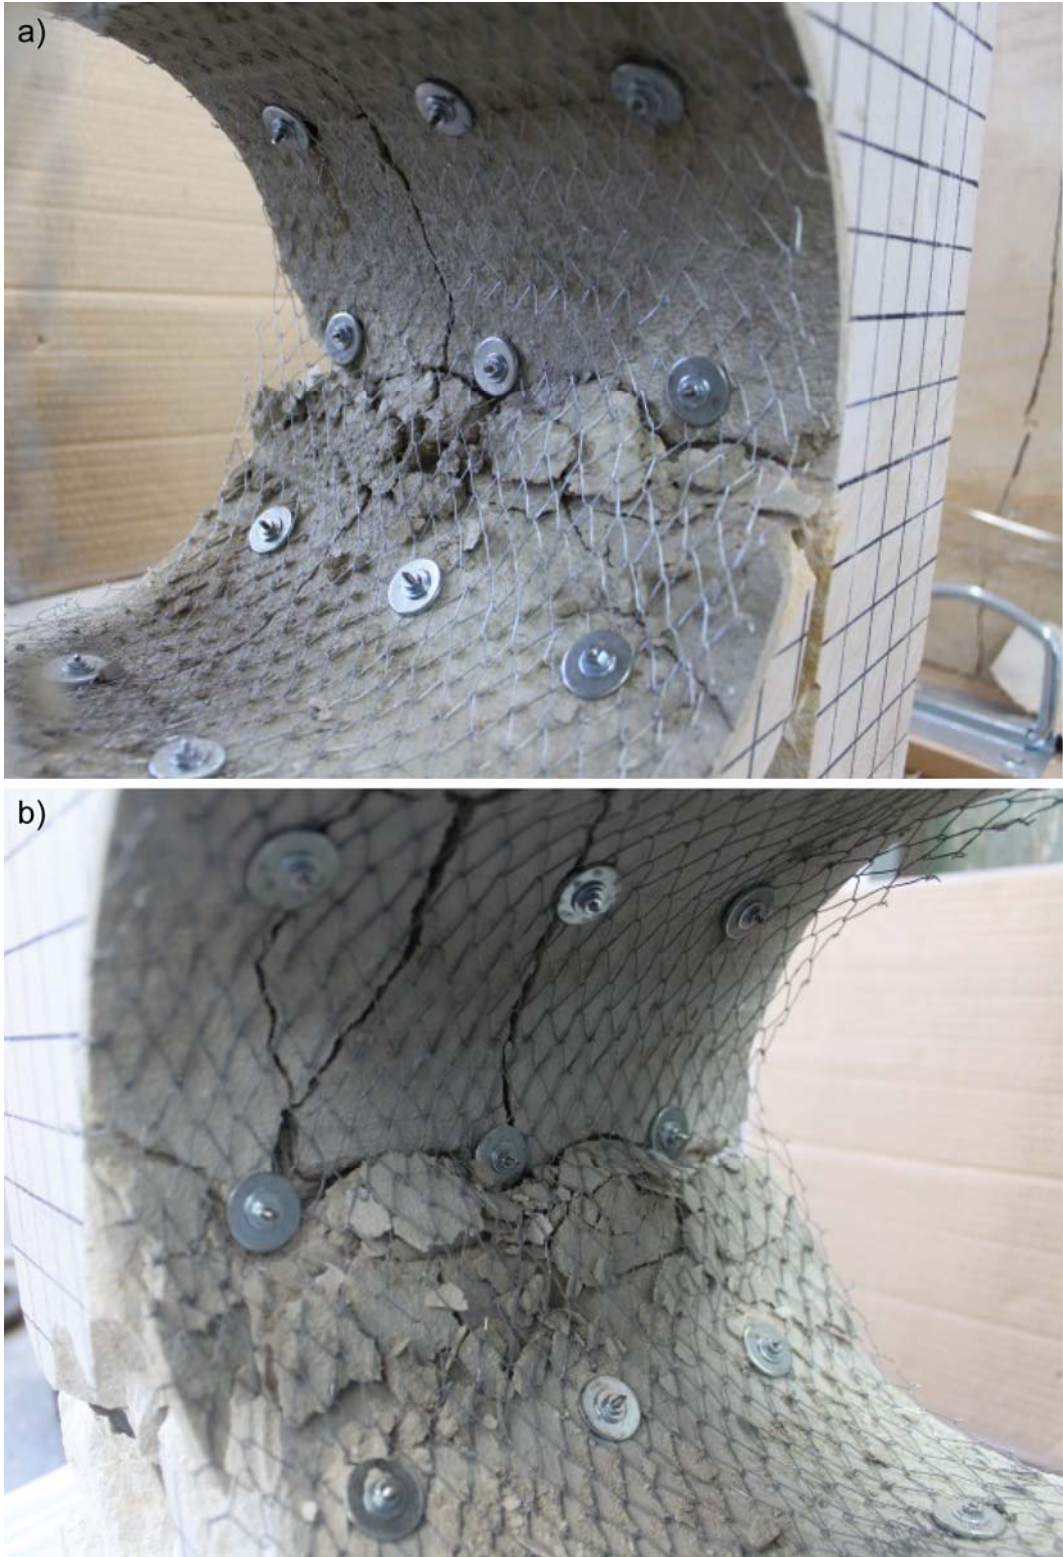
Excavation surface with a single layer after failure a) Specimen No.11
